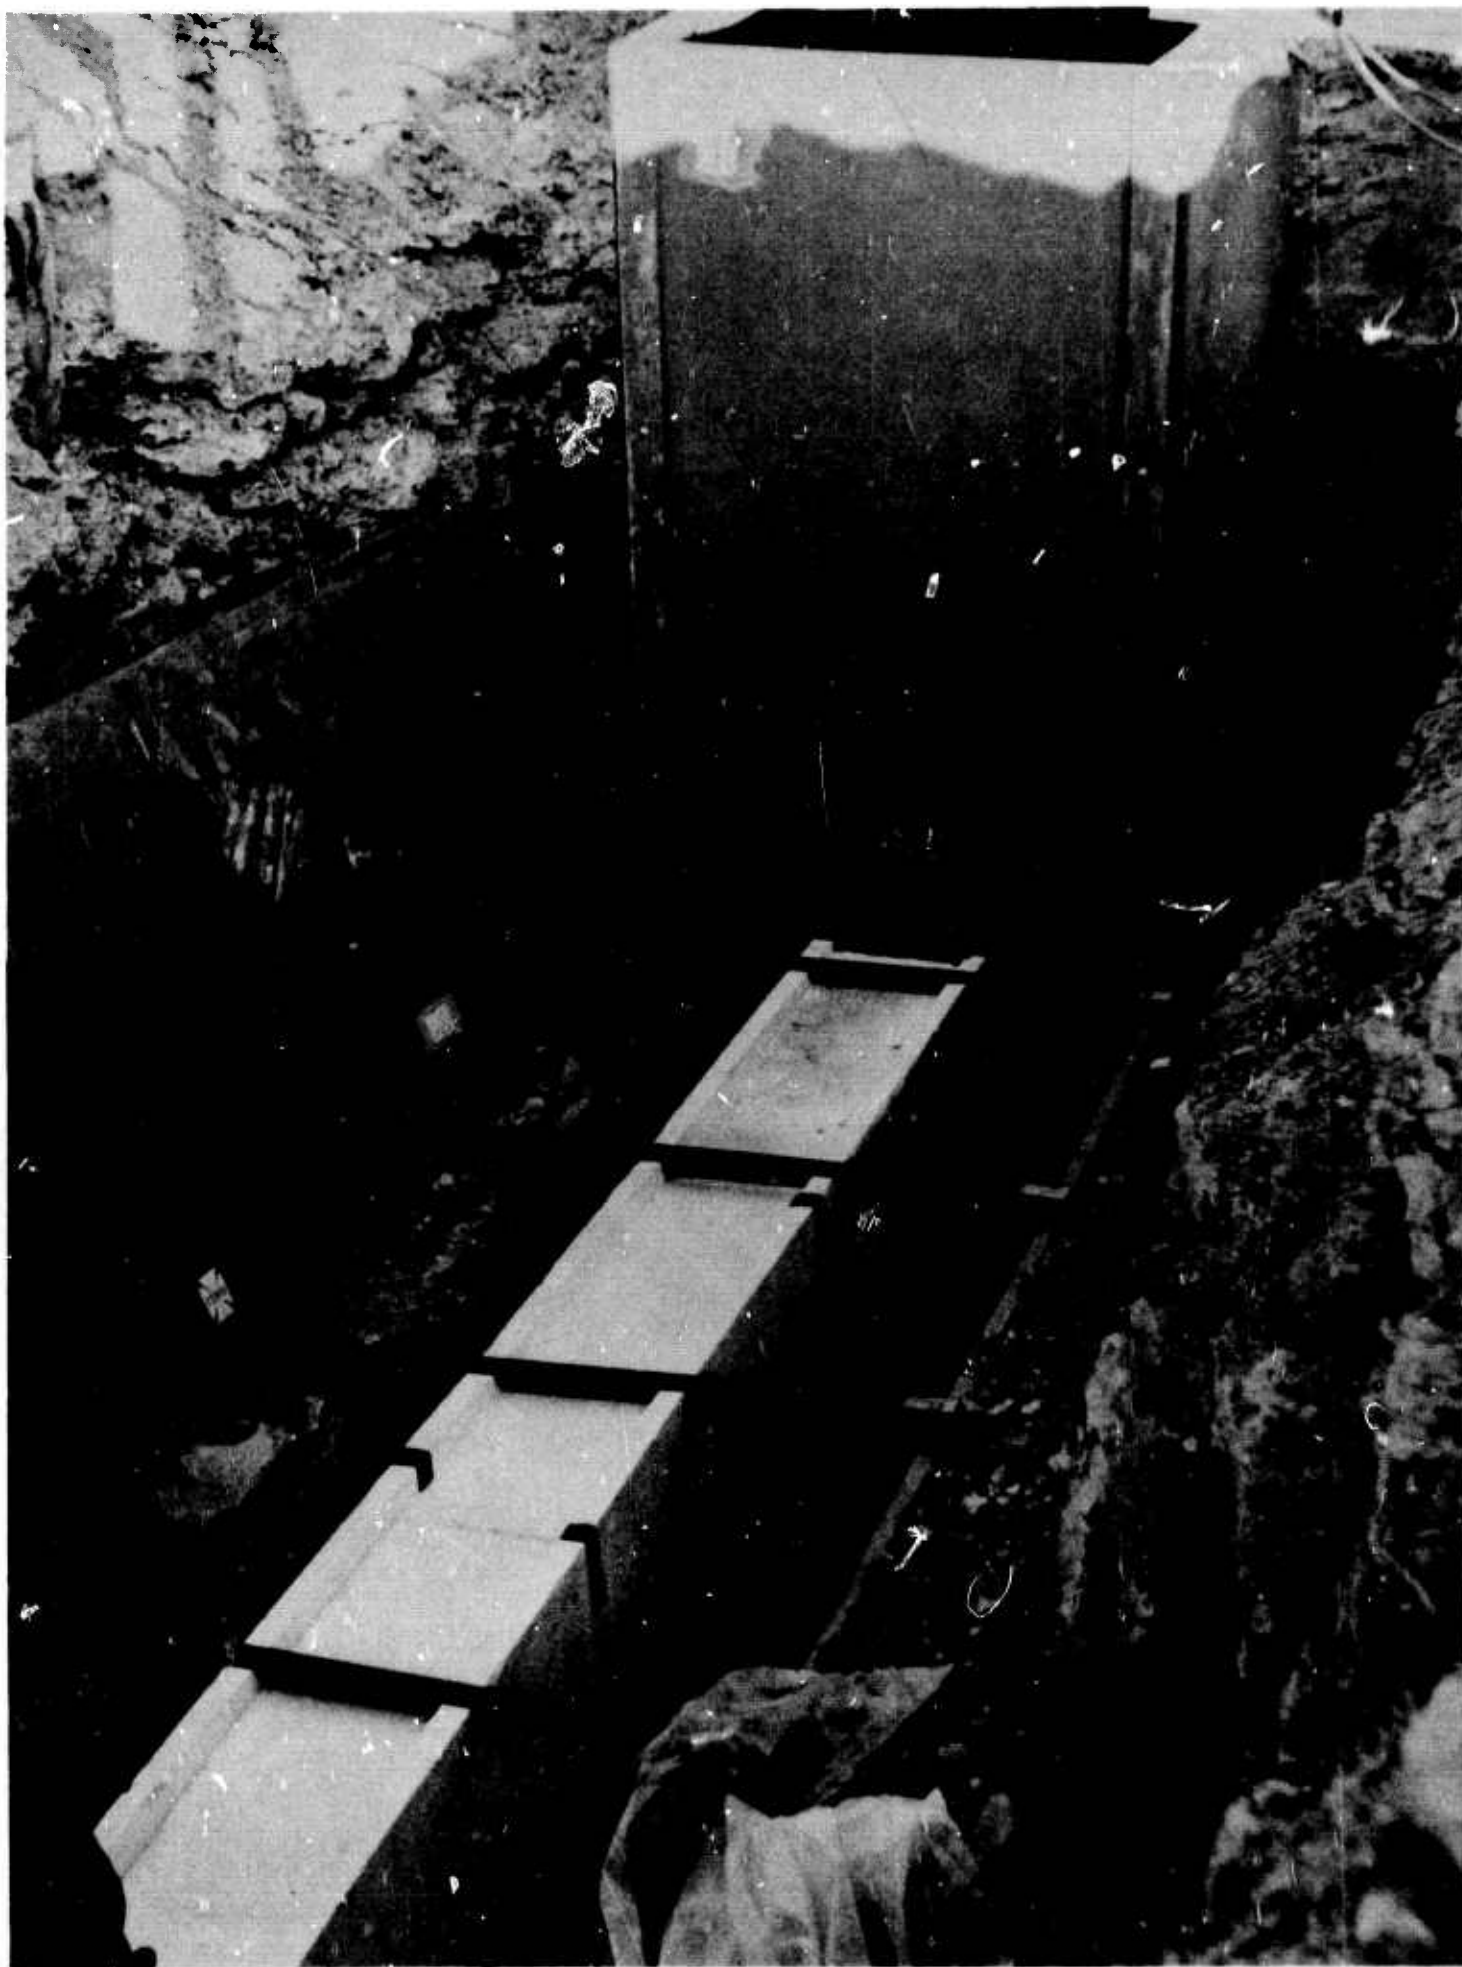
View of trench installation showing styrofoam insulation over the strainmeter, and showing the beams which support the culvert G 5687
